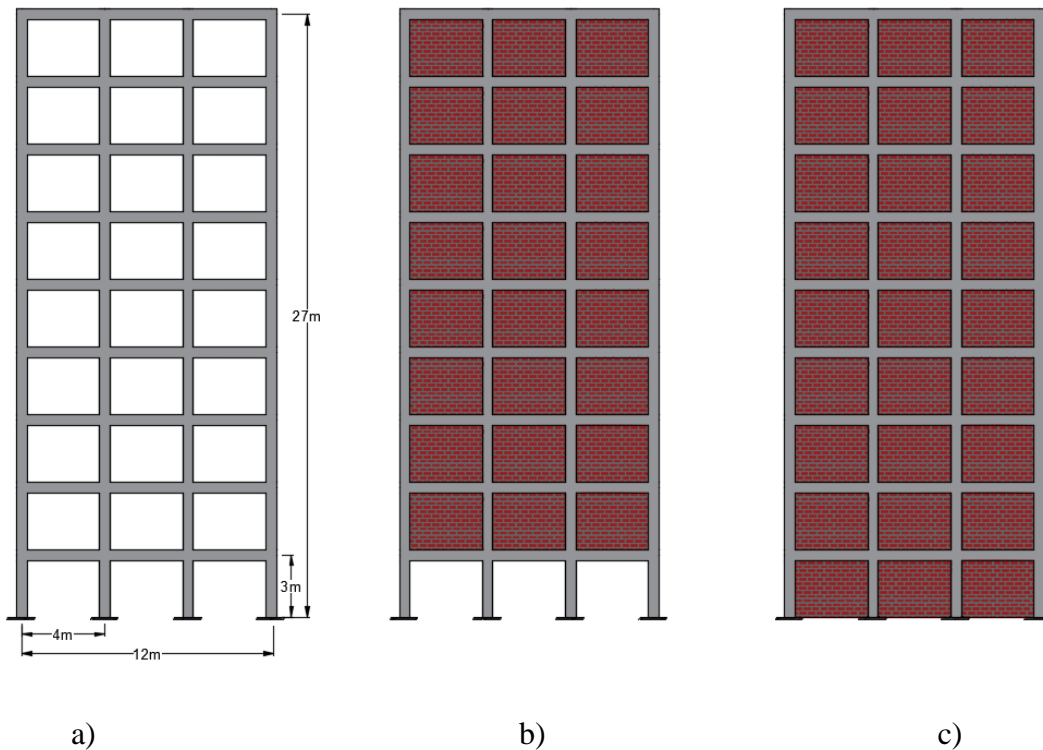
Elevation of three bay-nine storey (3B9S), a) bare frame/with deficiencies b) infilled frame without ground infills (stone-concrete/concrete masonry) c) infilled frame (stone-concrete/concrete masonry)
